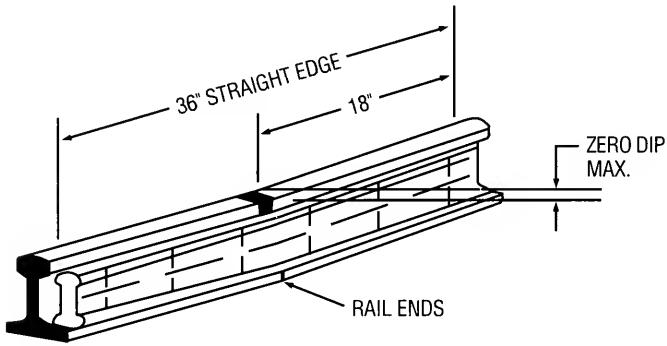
Elevation of Joint Showing Misalignment Tolerance in Vertical Alignment per Section 6.2.
